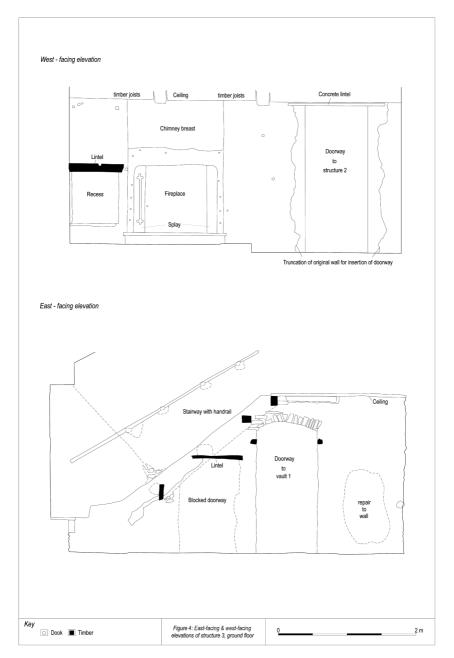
West-facing and east-facing elevations of structure 3, ground floor.
